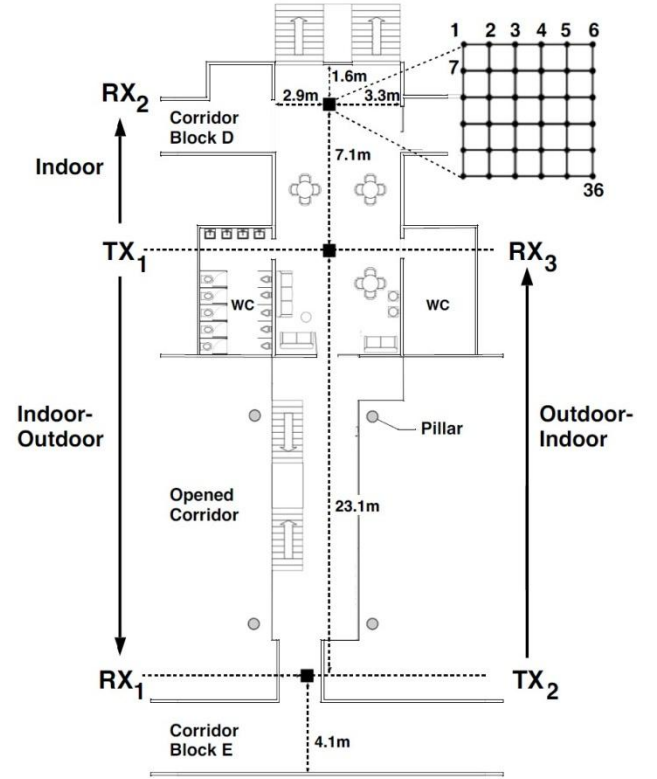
Plant layout - Third floor building, UFF Praia Vermelha Campus.
